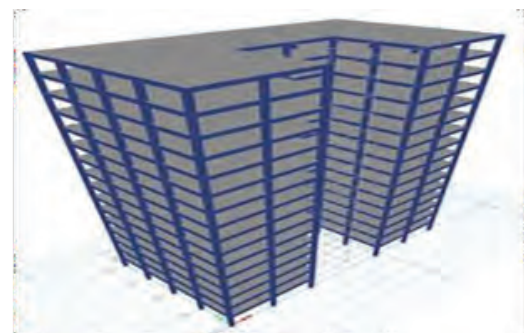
3D Model of G+15 C-Shaped Building with CFRP Circular Columns
